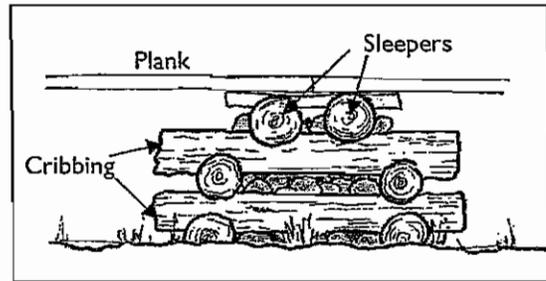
Bog Bridge with Sleepers, or Single Plank Boardwalk
